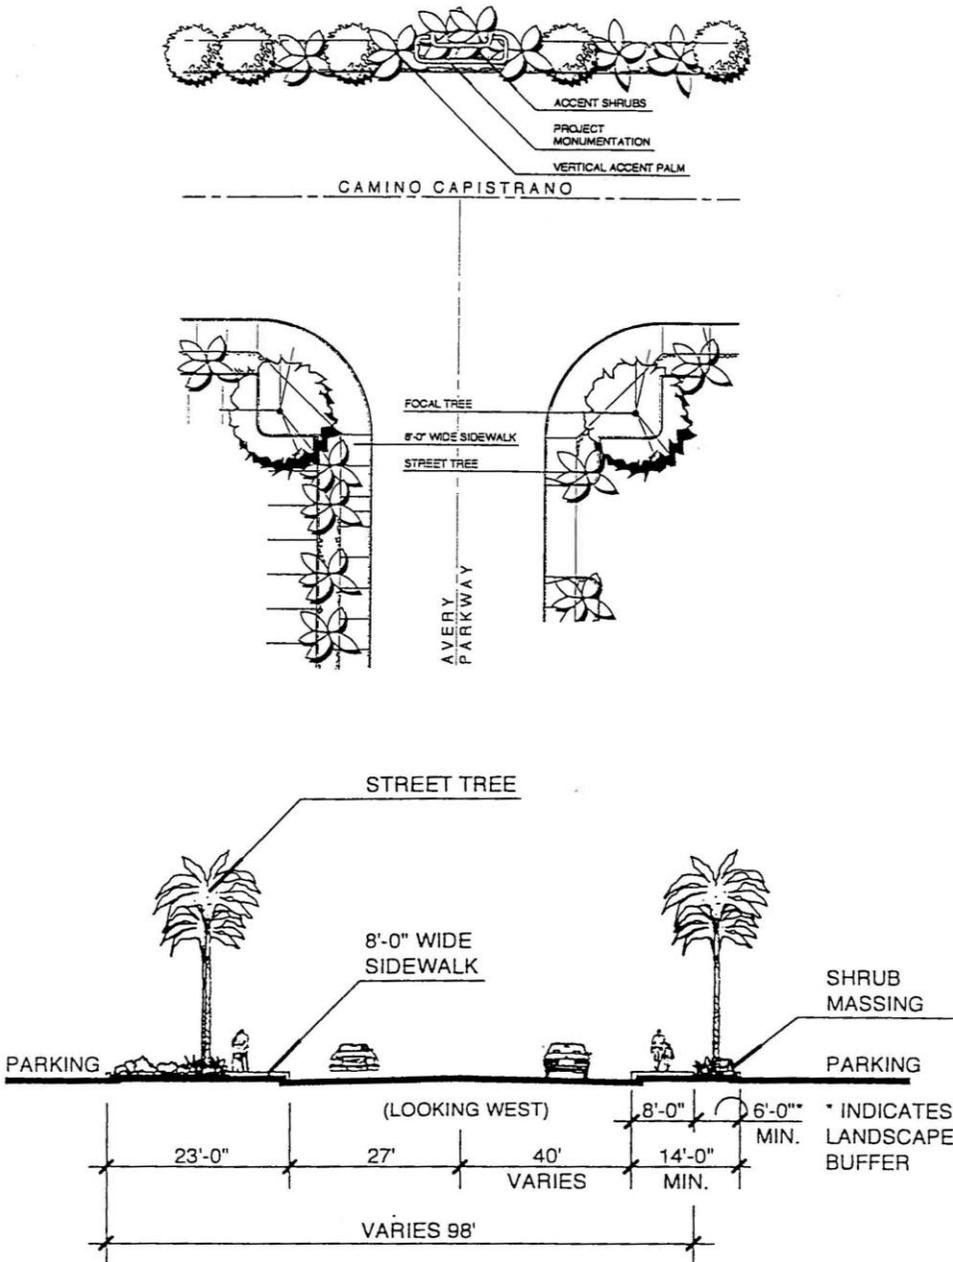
Avery Parkway: Typical Plan View, Character, Plant Palette, and Cross Sections
